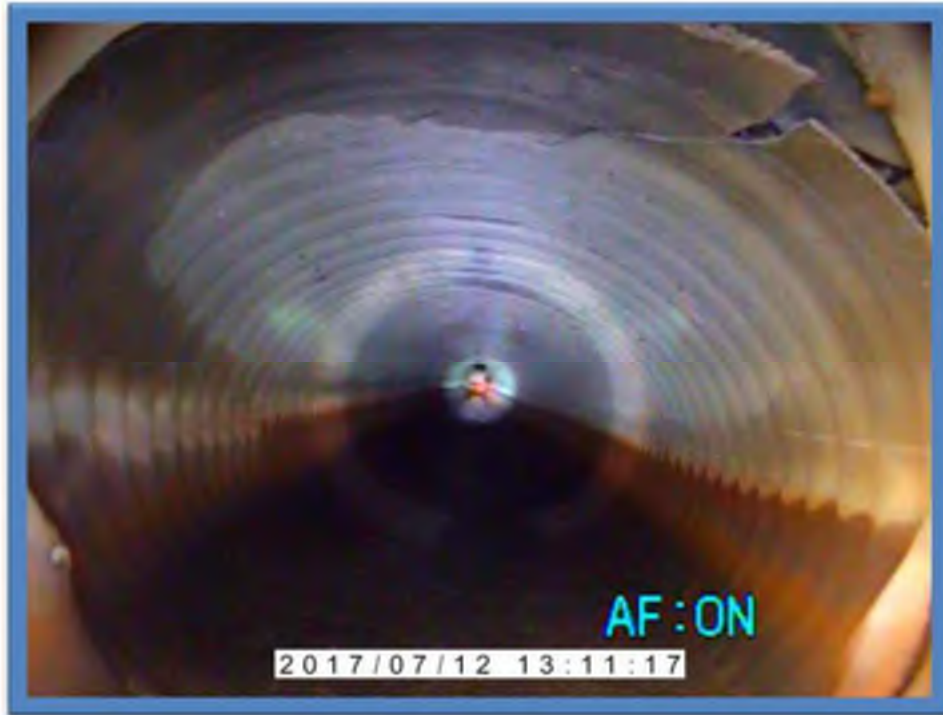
Pipe damage at crown of pipe at manhole connection
